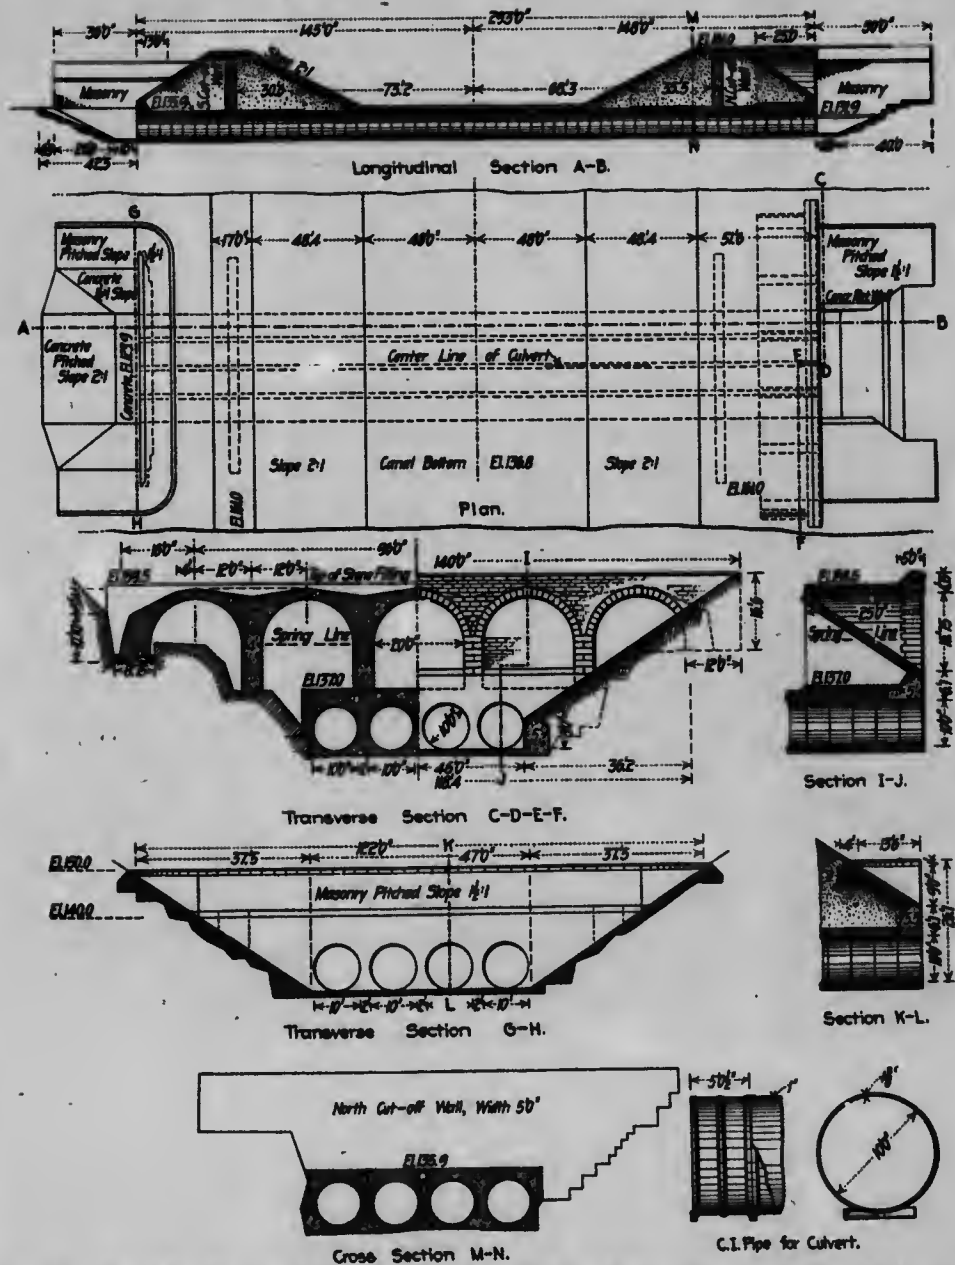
DETAILS OF CULVERT FOR DELISLE RIVER; SOULANGES CANAL WORKS, CANADA.
